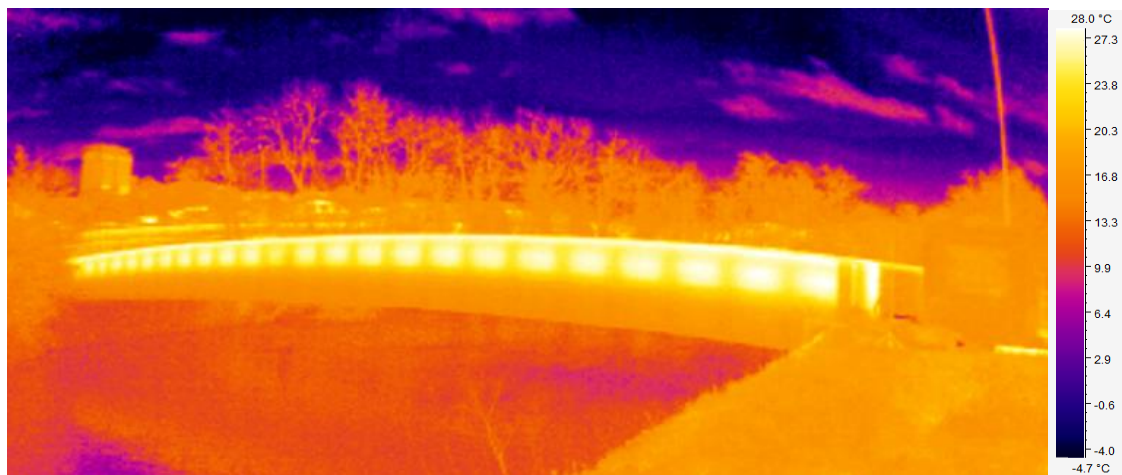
Thermal image of a steel girder bridge, in Exeter.
